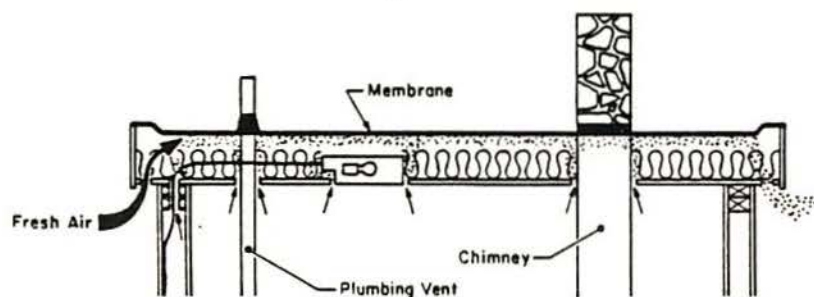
Air leakage paths into a ventilated flat roof with below-deck insulation.
